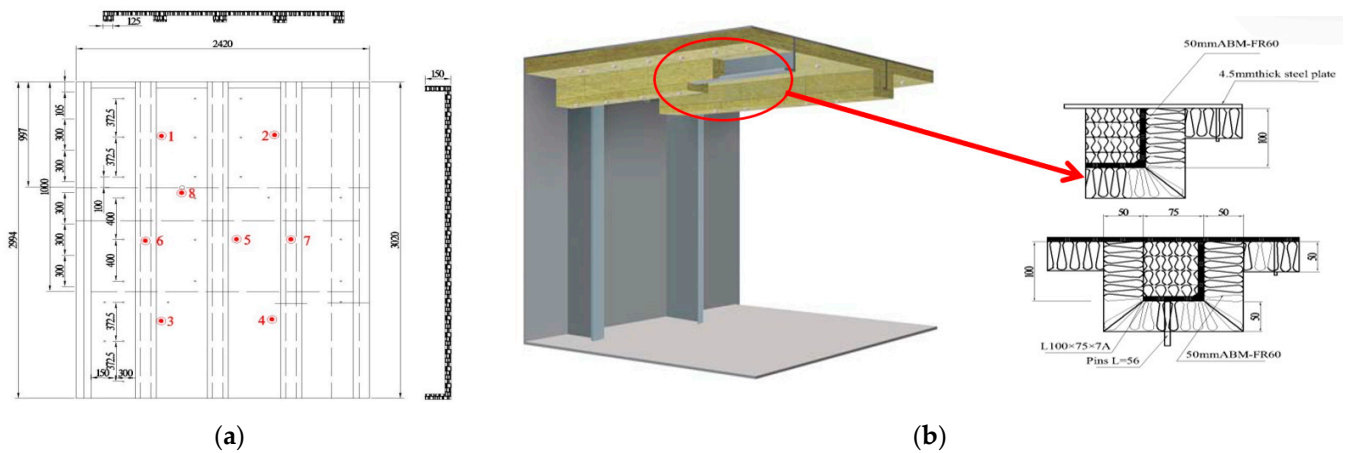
(a) Location of thermocouples on deck A-60; (b) section of A-60 deck specimen. (unit: mm).
